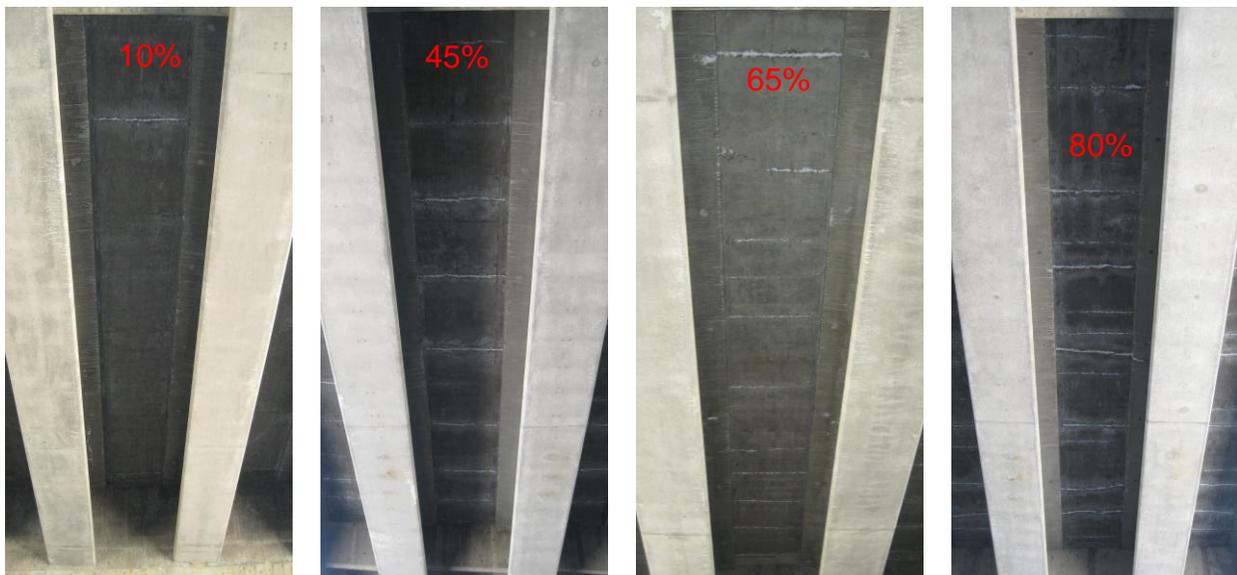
Range of Deck Cracking for Bridge 90/106N
